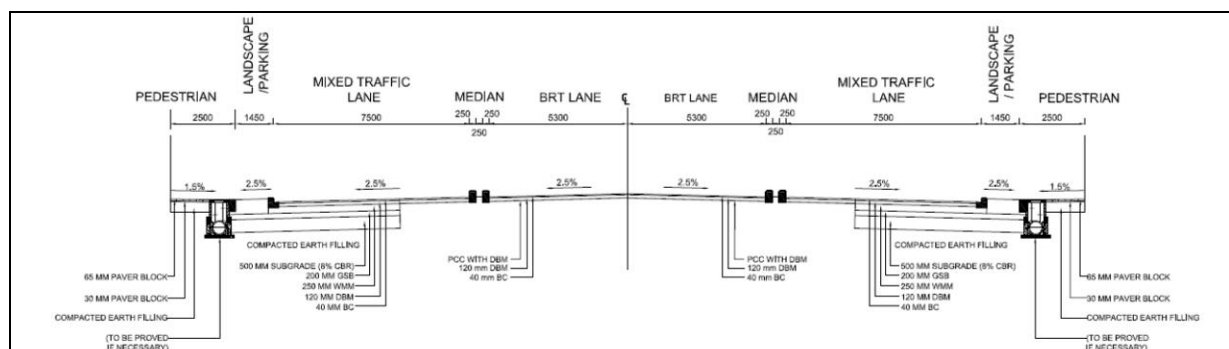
New Flexible Pavement for Mix Traffic and Overlay for BRT Corridor for 35m RoW
